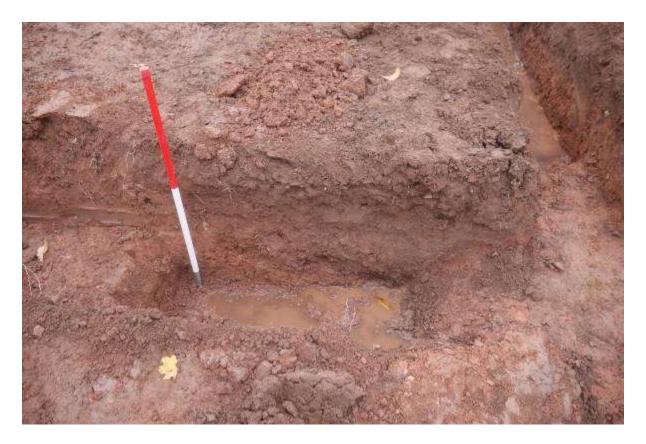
Section across linear cut feature (ditch) 102 looking North East where it was crossed by the new Southern foundation trench for the house. Location is 2 on Illustration 7.
